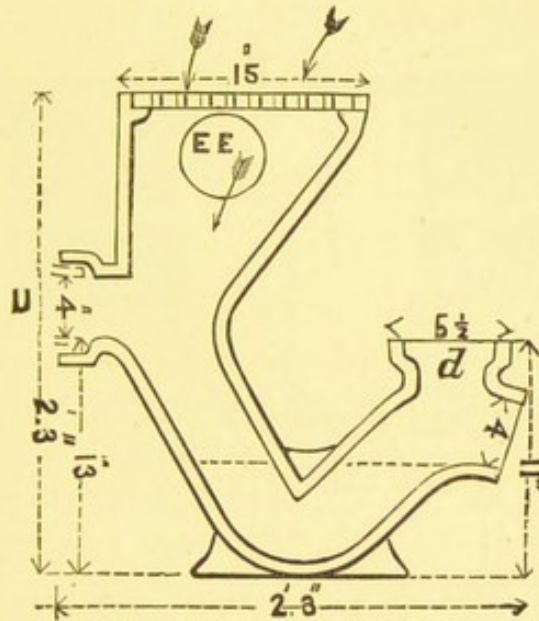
Vertical Section of a 4-in. "Ventilating Drain-syphon and Sewer-interceptor."
